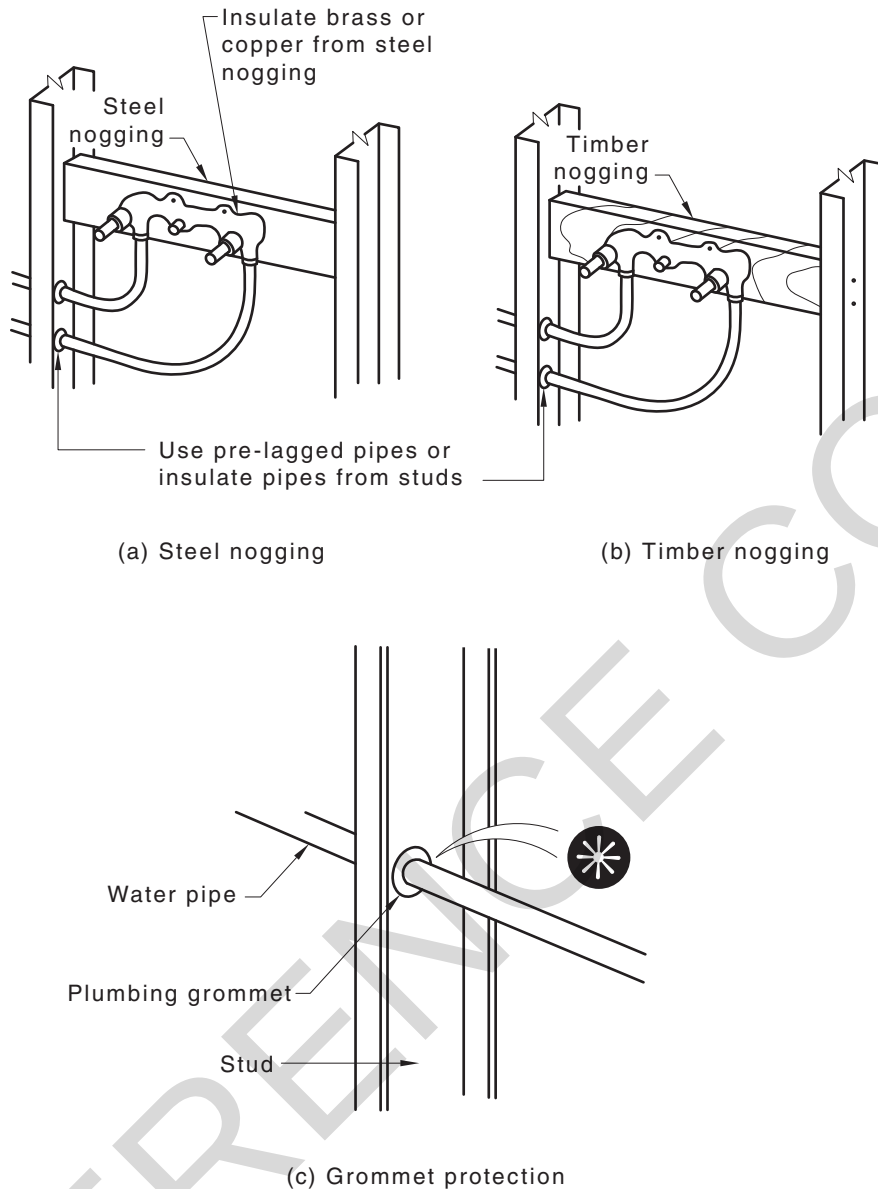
(D) INSTALLATION AND FIXING OF SERVICES
